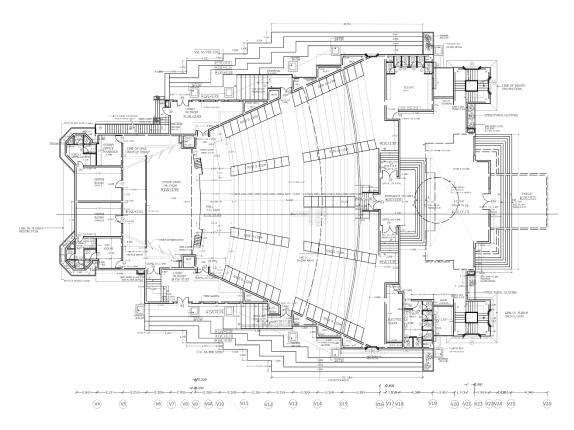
Plan [Image Source: VIMA, The Dimension (Architecture Firm)]
